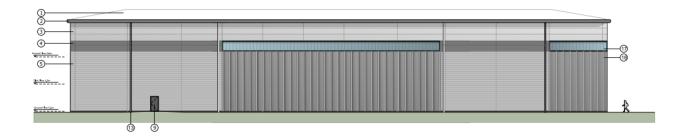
North Eastern Elevation of Unit 4 as amended
